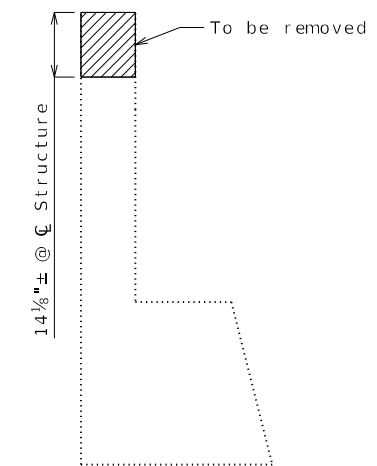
DETAILS OF CONCRETE REMOVAL AT END BENT NO. 1
